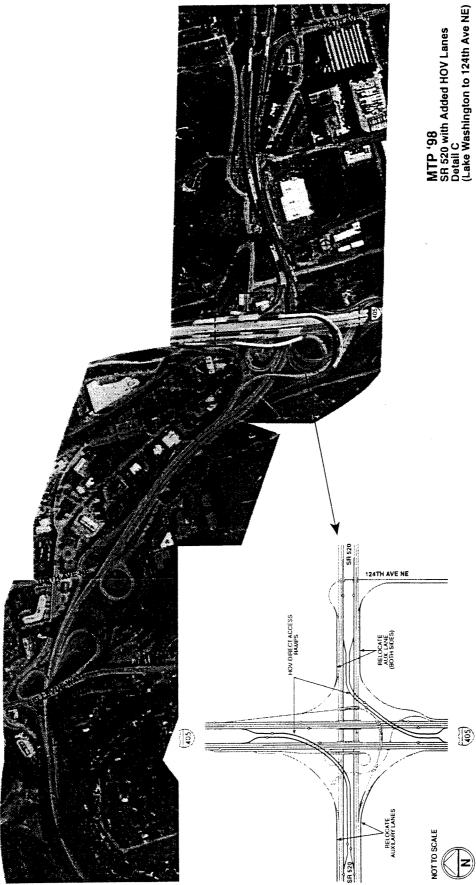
Detail C: Interchange modifications at I-405, including direct access HOV ramps
